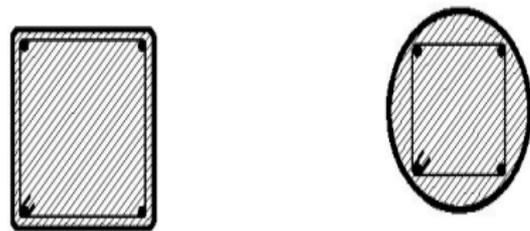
Concrete filled steel tubes (CFST)(rectangular and circular sections)
